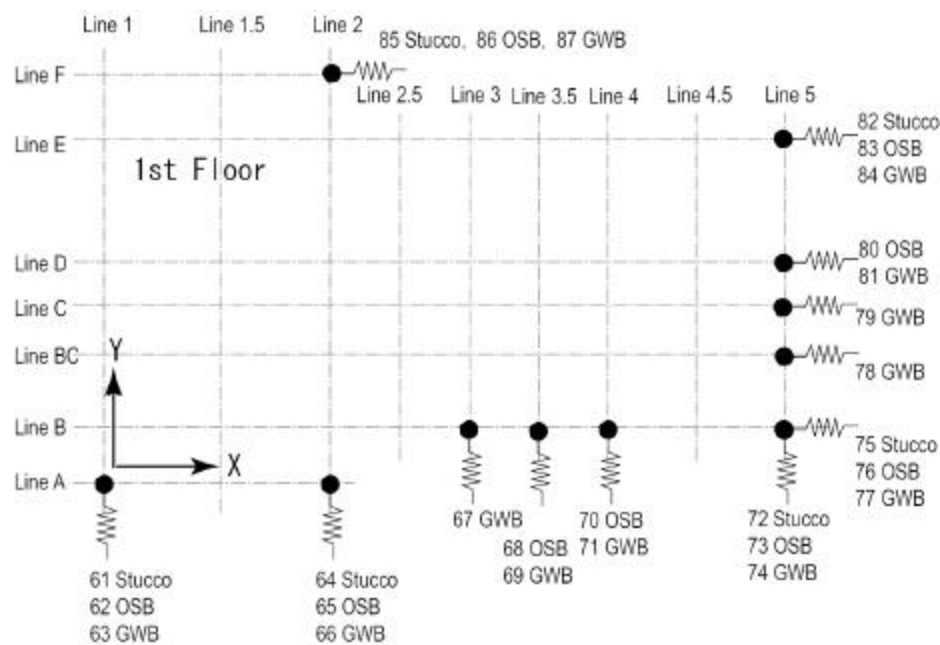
Locations, Orientation and Numbering of Shear Elements for Interior and Exterior Vertical Walls on the First floor of the Large-House Index Building.
